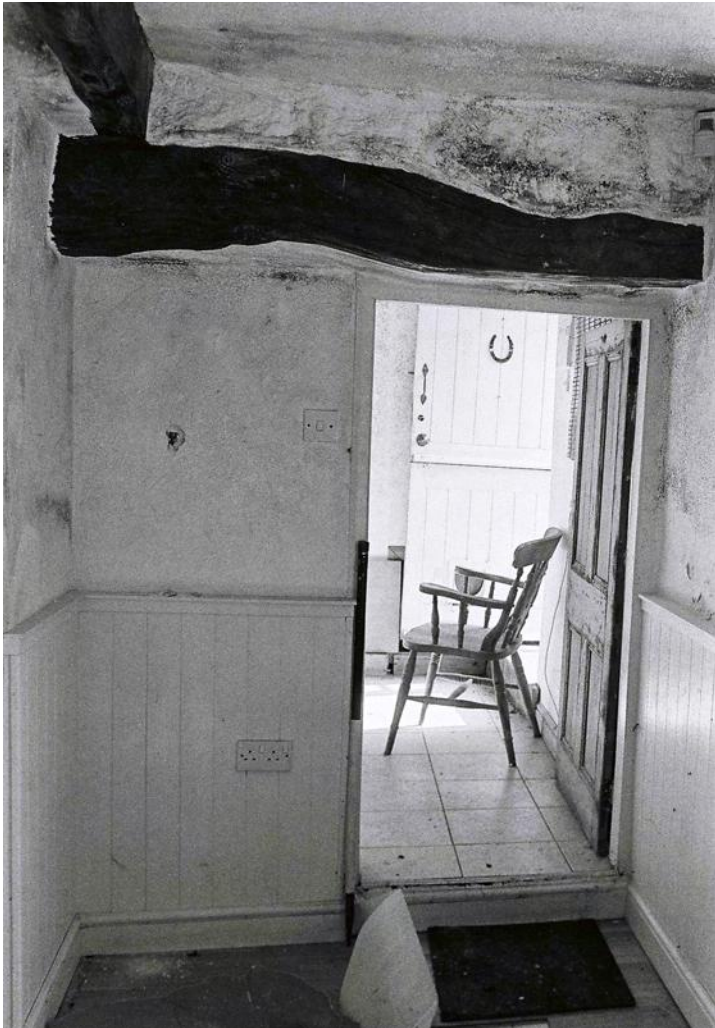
Shaw House Farm: Cottage Interior Ground Floor. Facing East.
